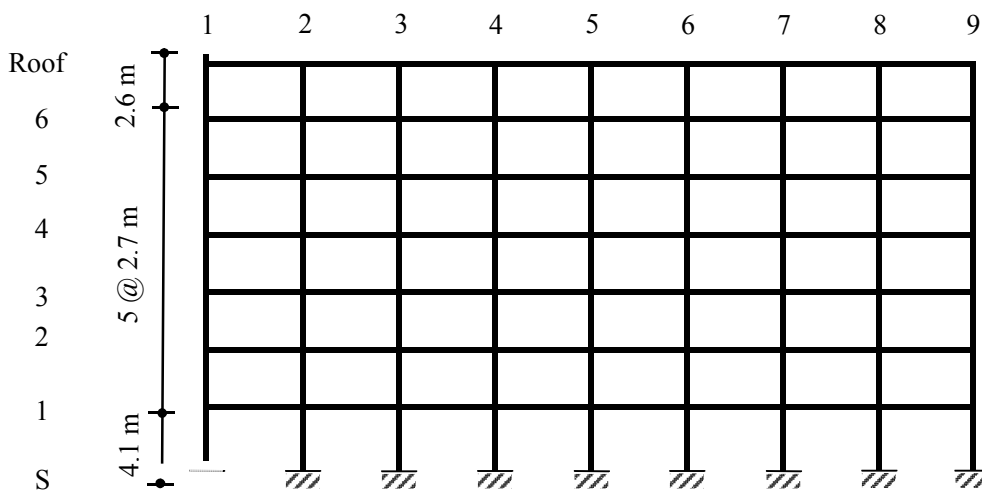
Typical longitudinal frame. Van Nuys building.
